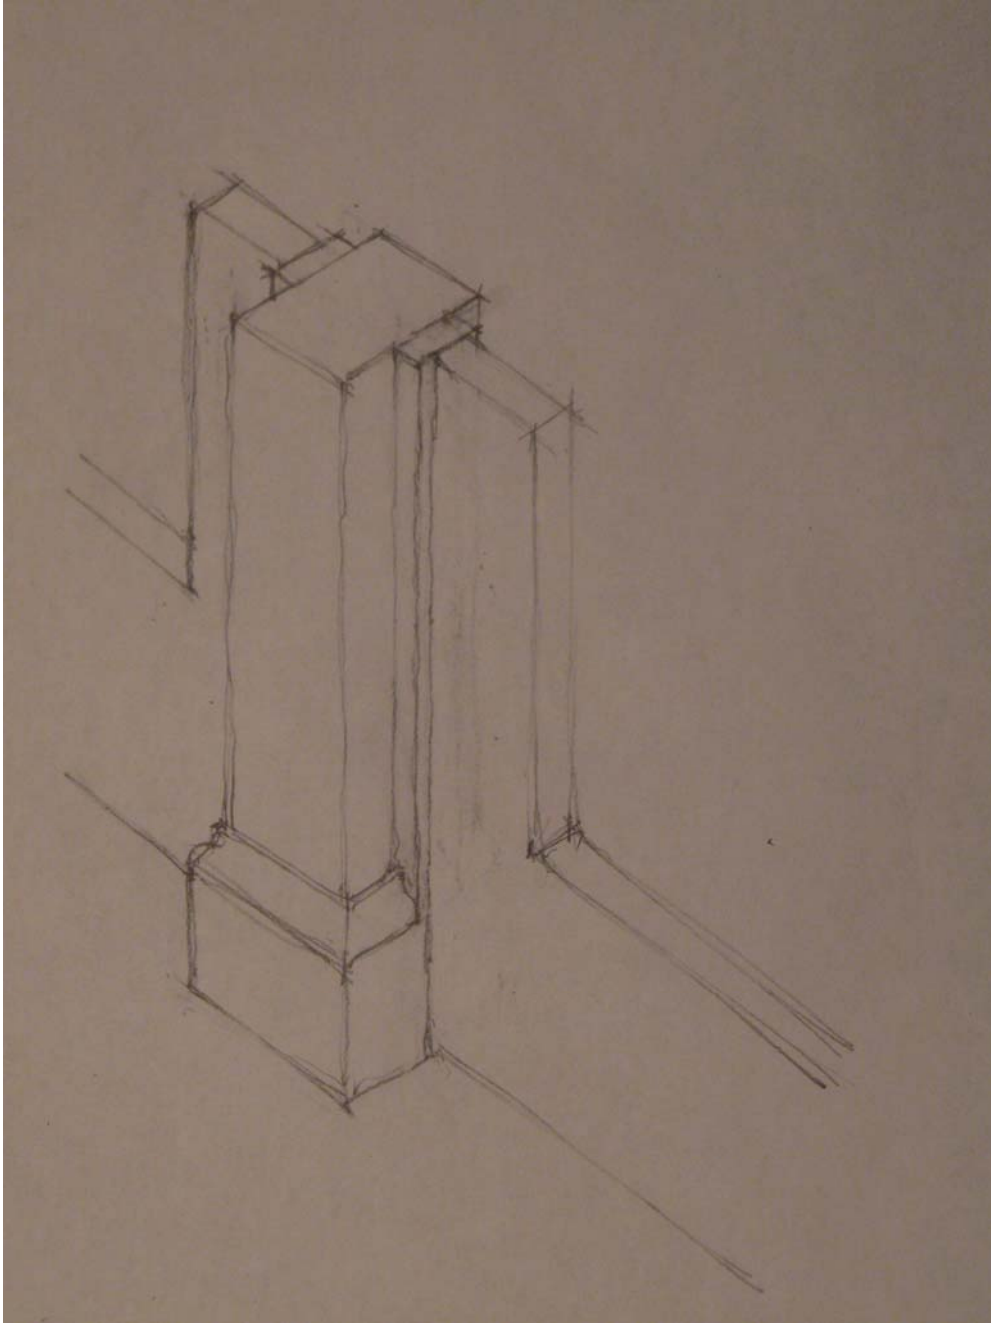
Mounting Detail of Shed Roof Porch Enclosure to Existing Wood Porch Posts
